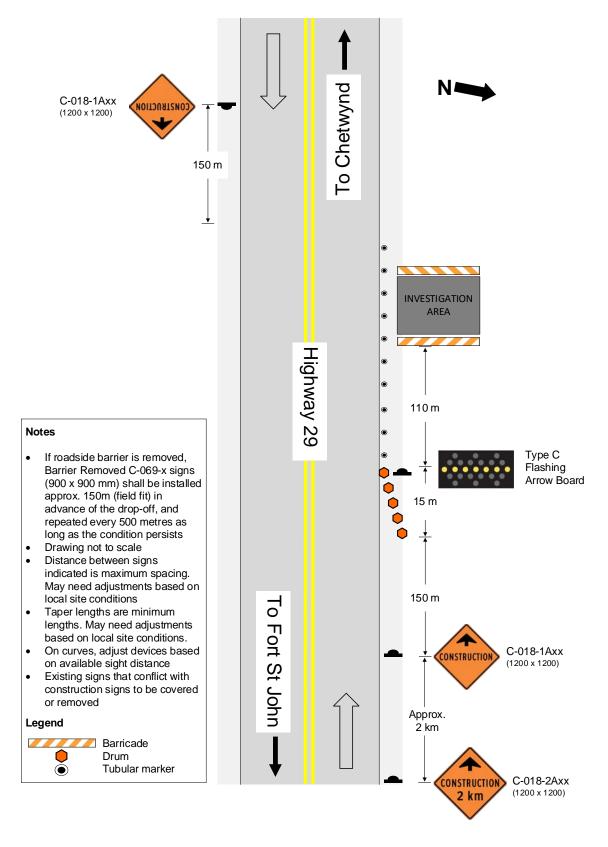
Shoulder Work will be used for the geotechnical investigation at 1 of the 4 test pit locations which will be performed on the shoulder, but off the travelled roadway.
